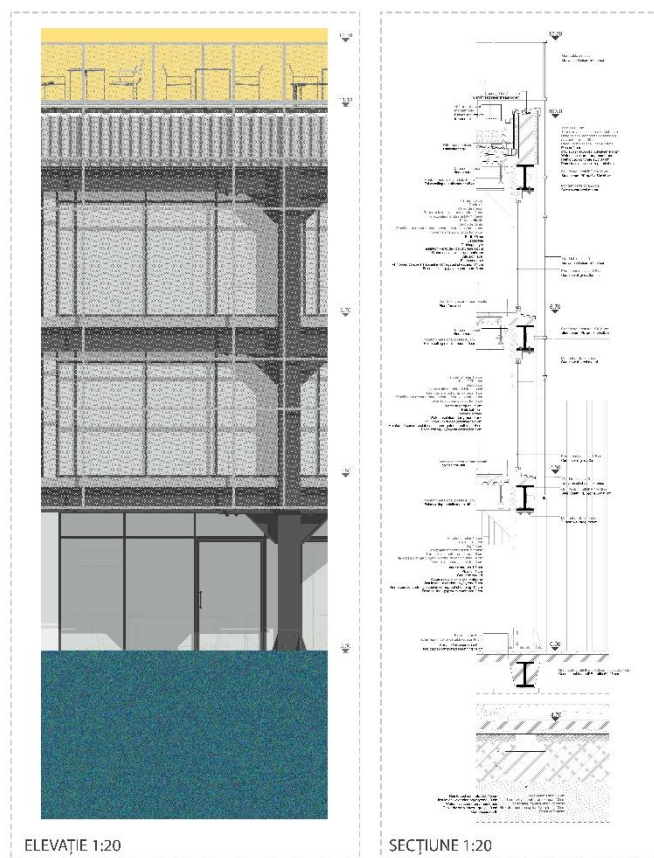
Additional volume to the Cehoslovaka Factory. Facade and cross section in details
